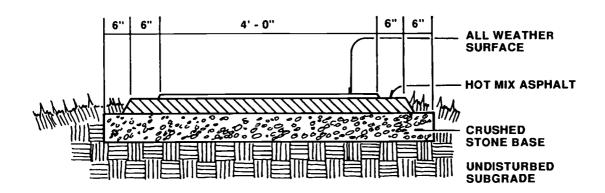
LONG JUMP / TRIPLE JUMP PIT PLAN
